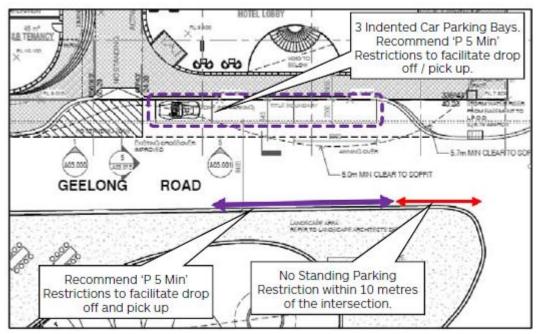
Proposed on street parking arrangements in Geelong Road. Source: Application documents
